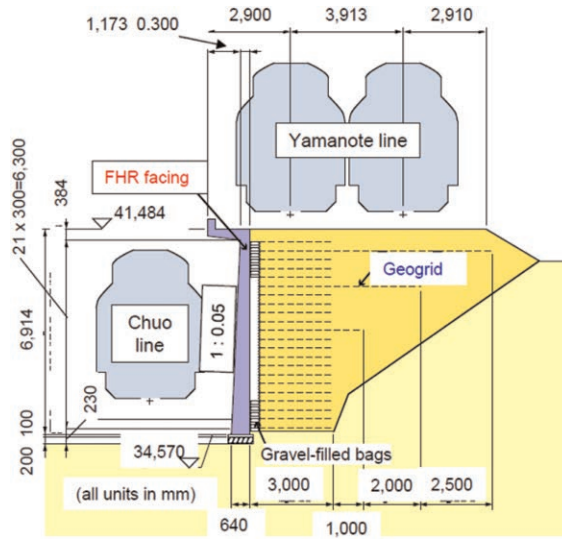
Typical FHR-GRS wall section (Tatsuoka 2008).
